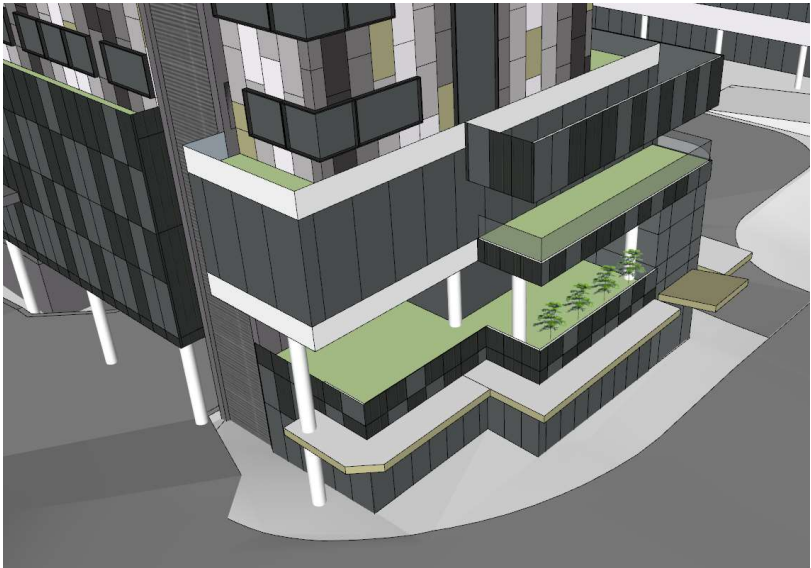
Balcony and Terrace providing external outlook and architectural articulation
